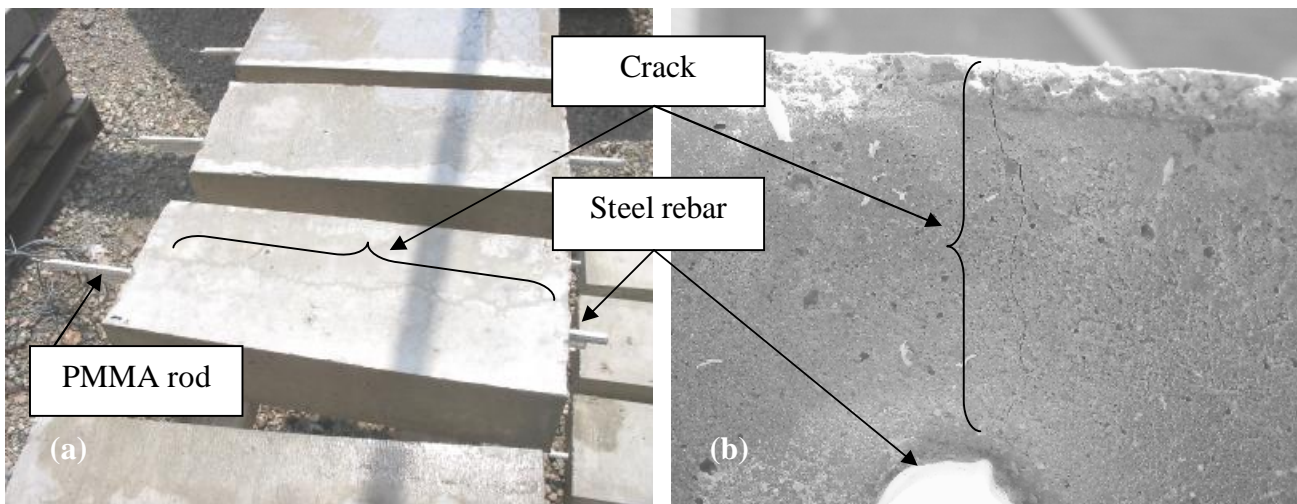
9. Longitudinal crack, parallel to the steel rebar, created by expansion of the plastic rod (a) longitudinal view, (b) end view.
